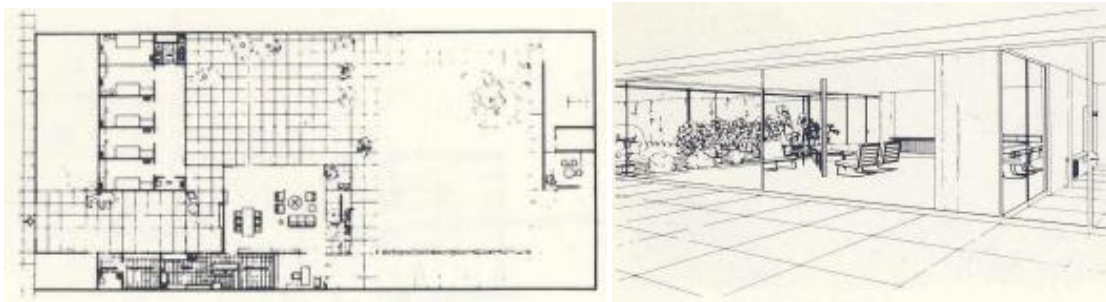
Left: House Dessau (1930s) plan. Right: House Dessau perspective (both UIA International, 1985:60).
